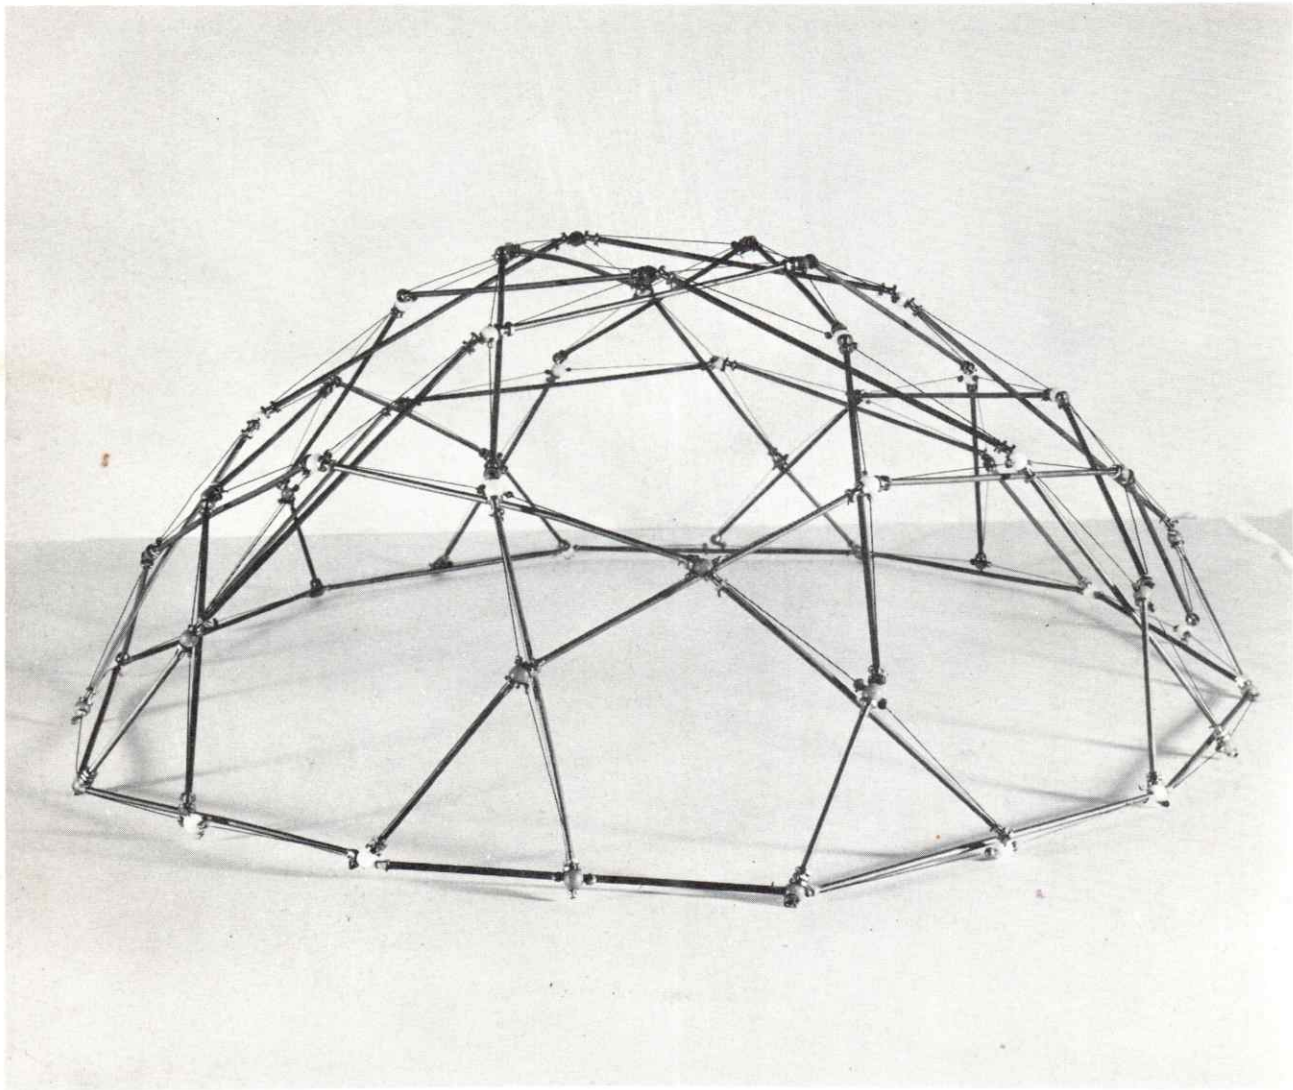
4^V Alternate breakdown. Similar to Fig. 56 in geometry, tension wire eliminates induced bending problem, continuous struts again stabilize hex-pent assemblies. Project by Taisei Construction, Japan.
